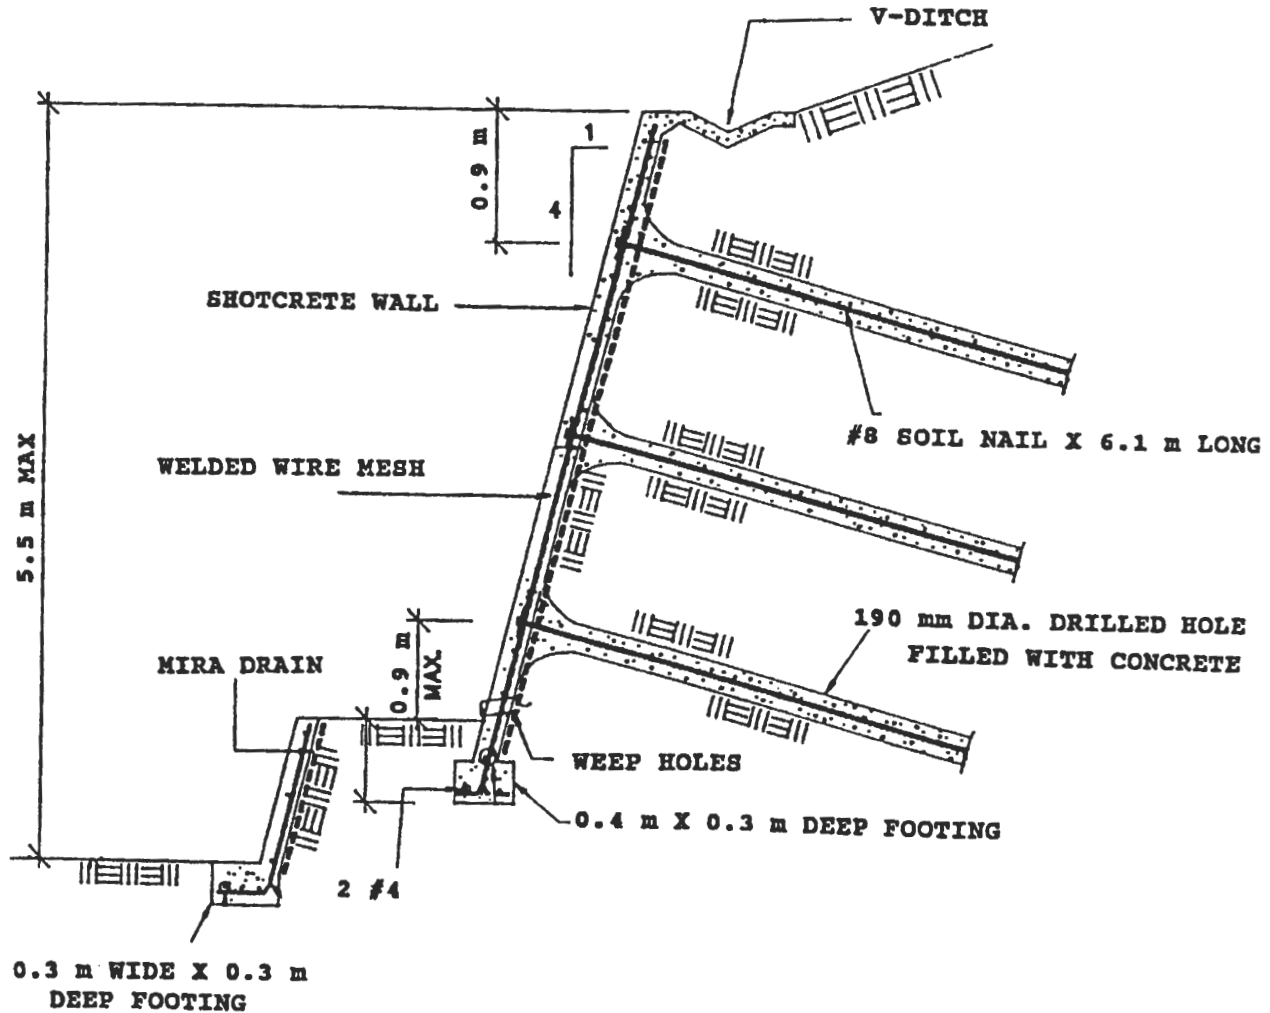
Cross section of a permanent soil-nailed retaining structure located in San Ramon (NME wall), Calif. (Barar, 1990).
